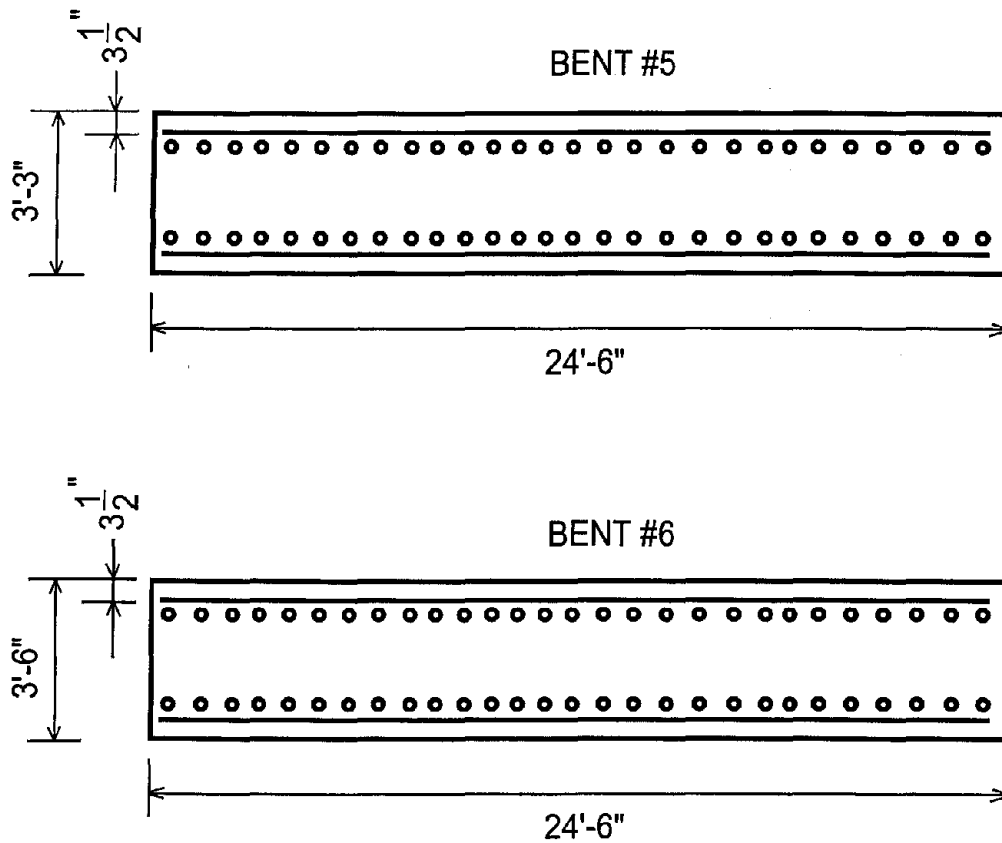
Dimensions and reinforcement for load frame footings (1' = 305 mm, 1" = 25.4 mm)
